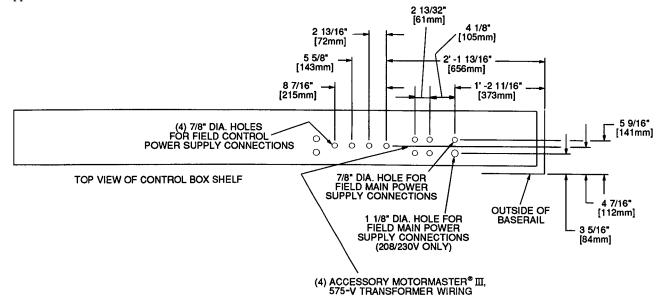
Power Wiring Access Holes; 054-094 Units
